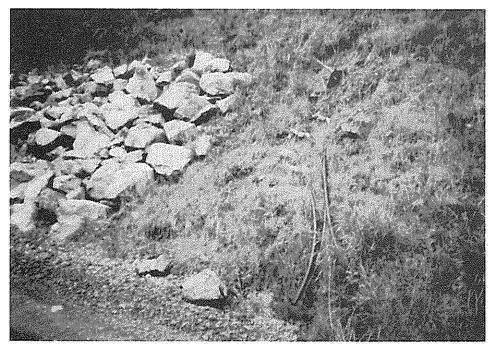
Pipes carry flow from horizontal drains to stable outlet
